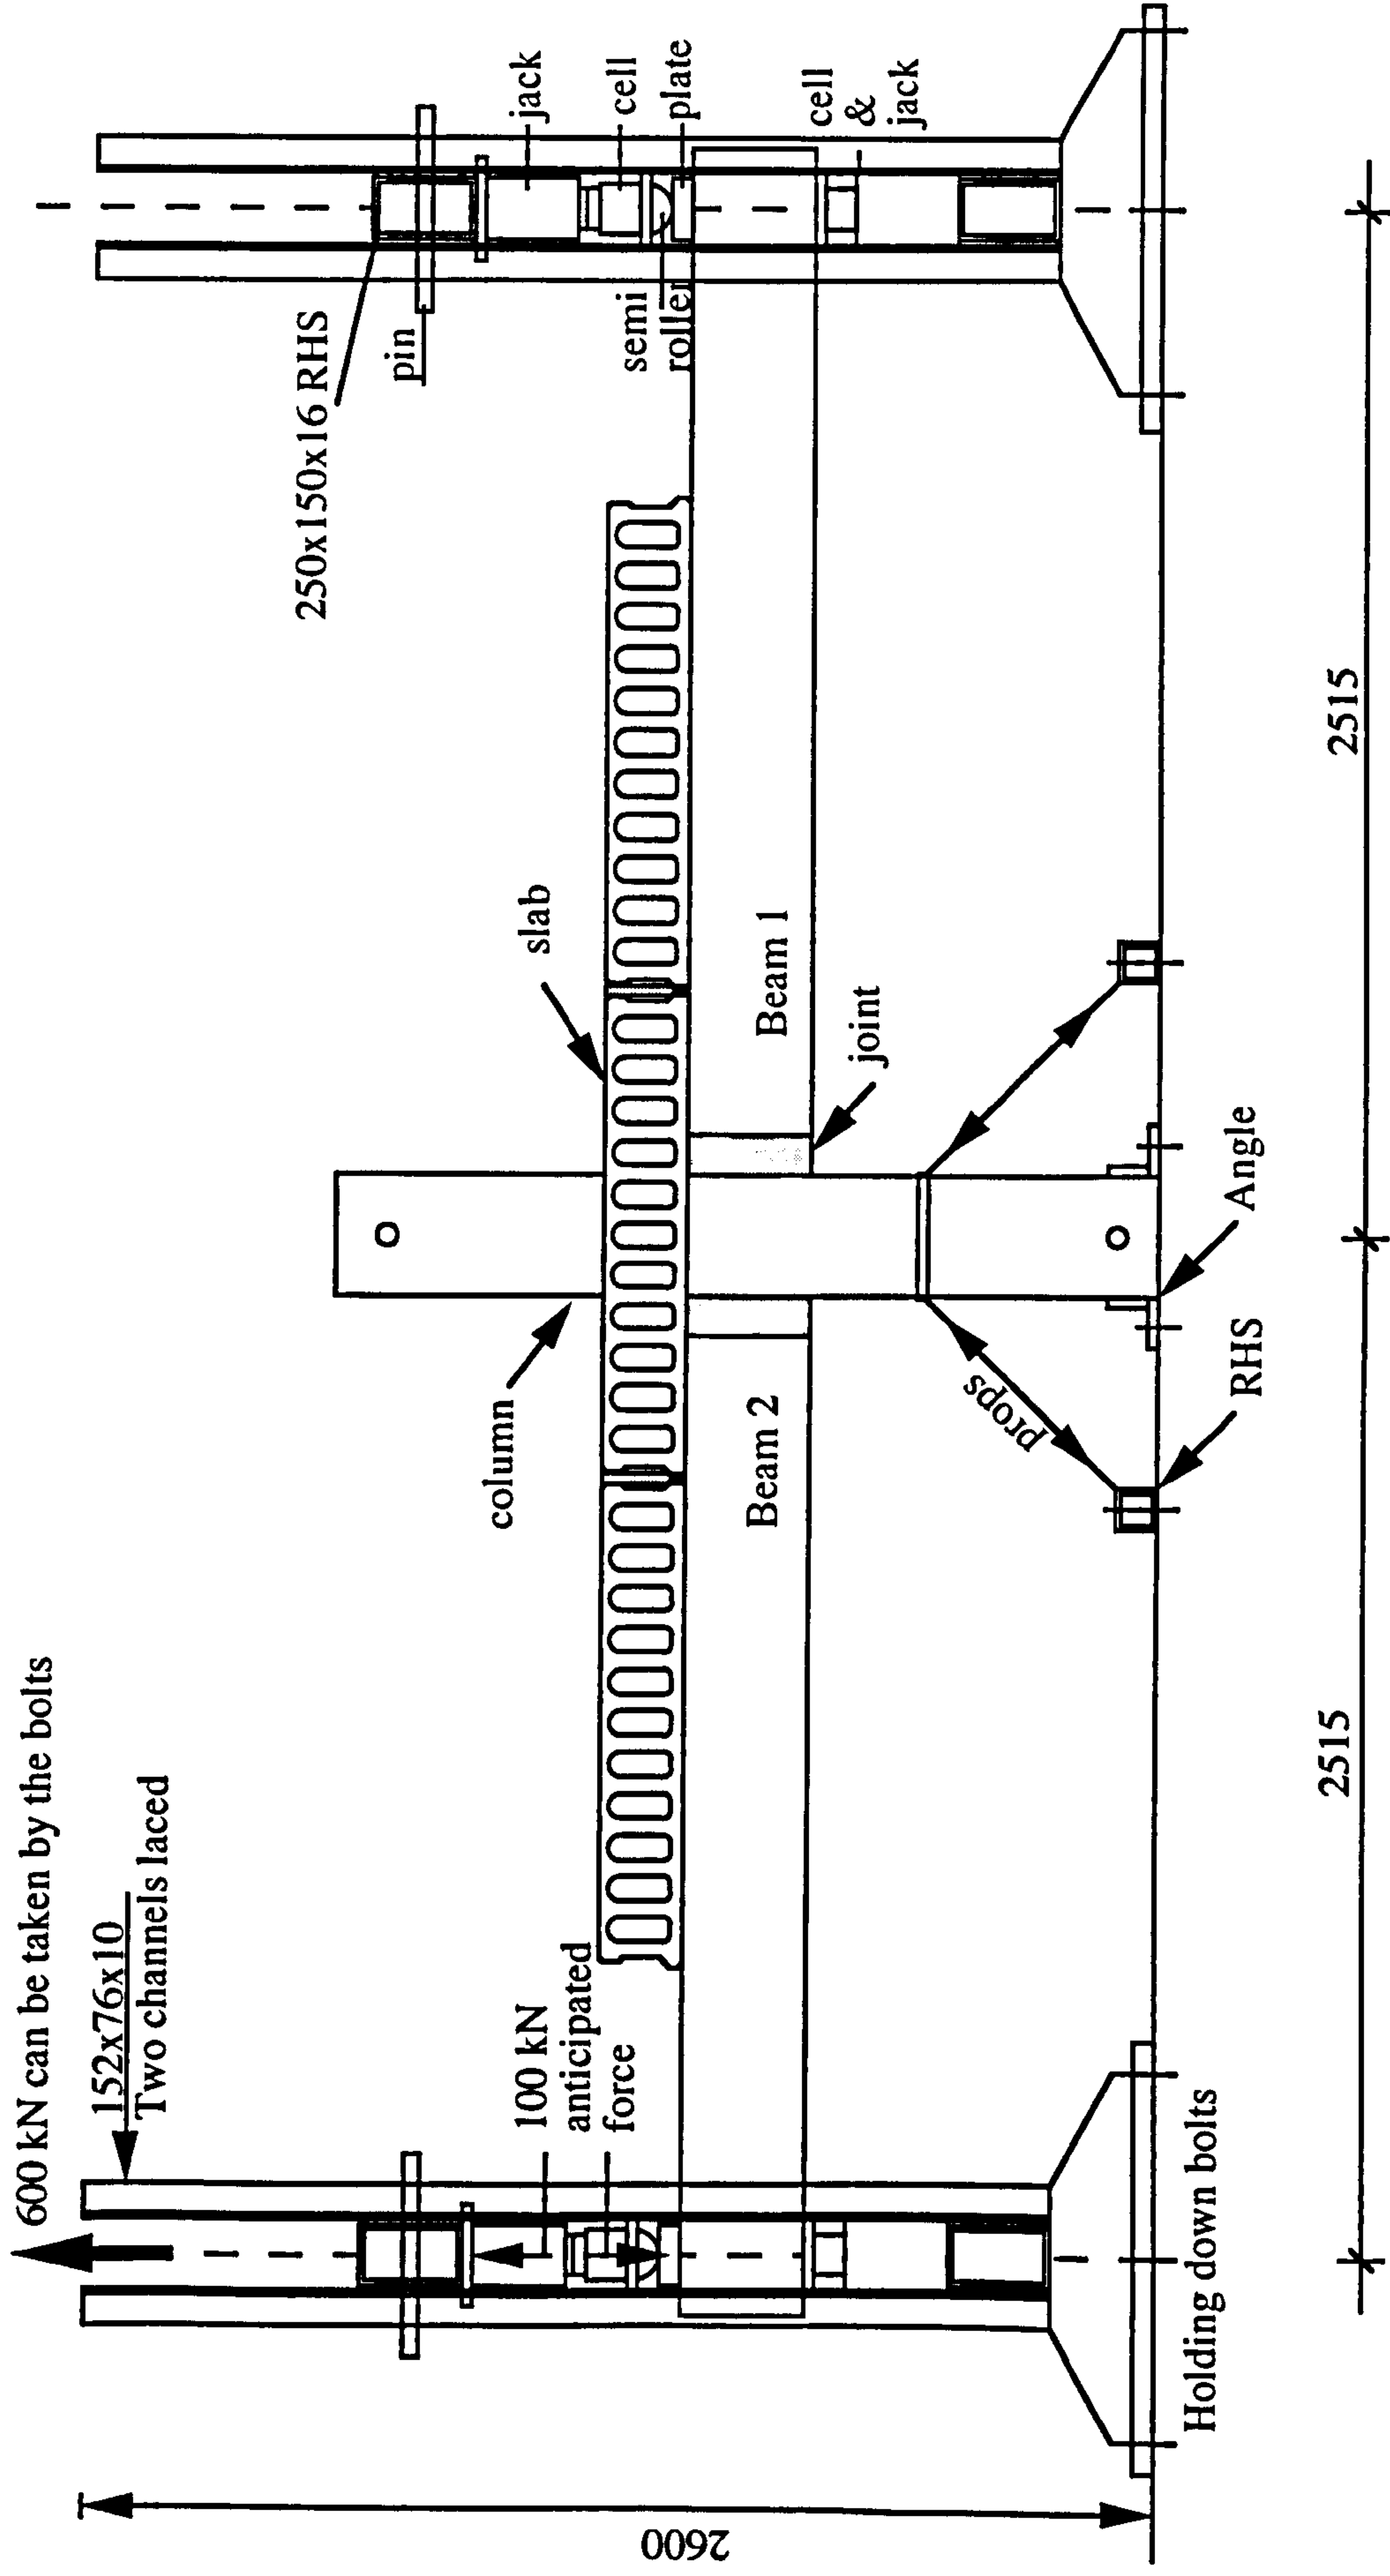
(a): Front elevation of the test rig with subframe SF1
